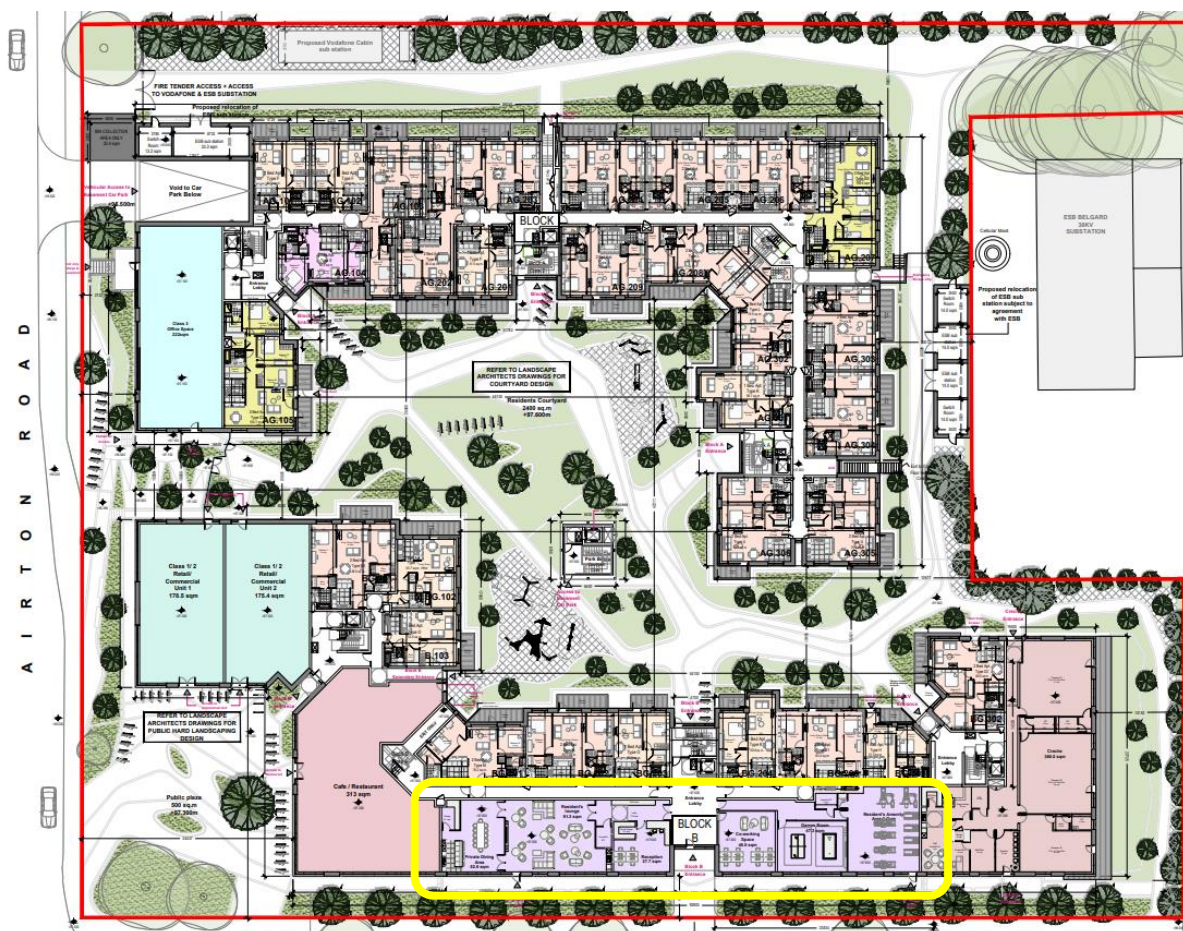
Ground floor layout plan approved under ABP Ref. ABP-305763-19 with the consolidated internal communal amenity space featuring outlined in yellow
